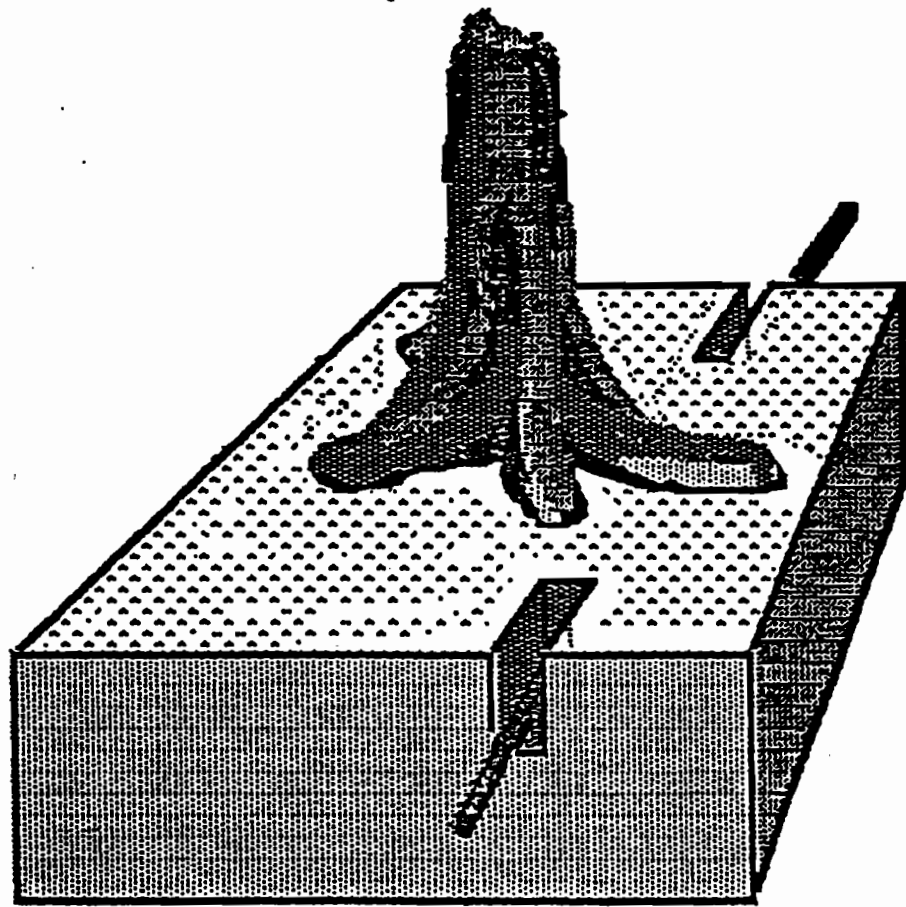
TUNNELING FOR UNDERGROUND UTILITIES
